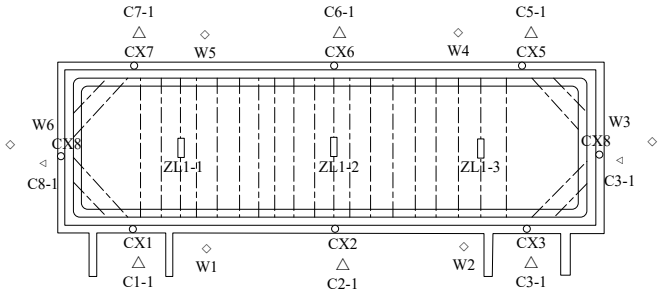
Plan Layout Diagram of Monitoring Points for Foundation Pit
